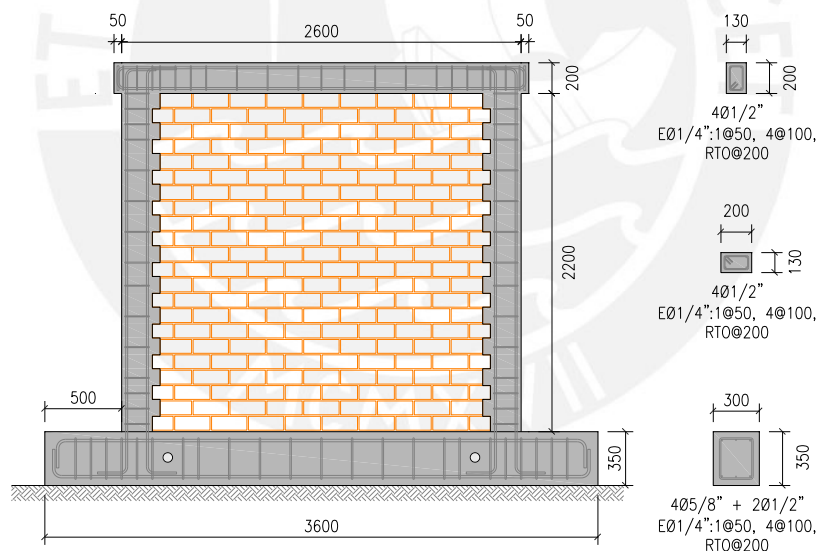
Geometry and reinforcing detail of a typical wall - Dimensions in millimeters
